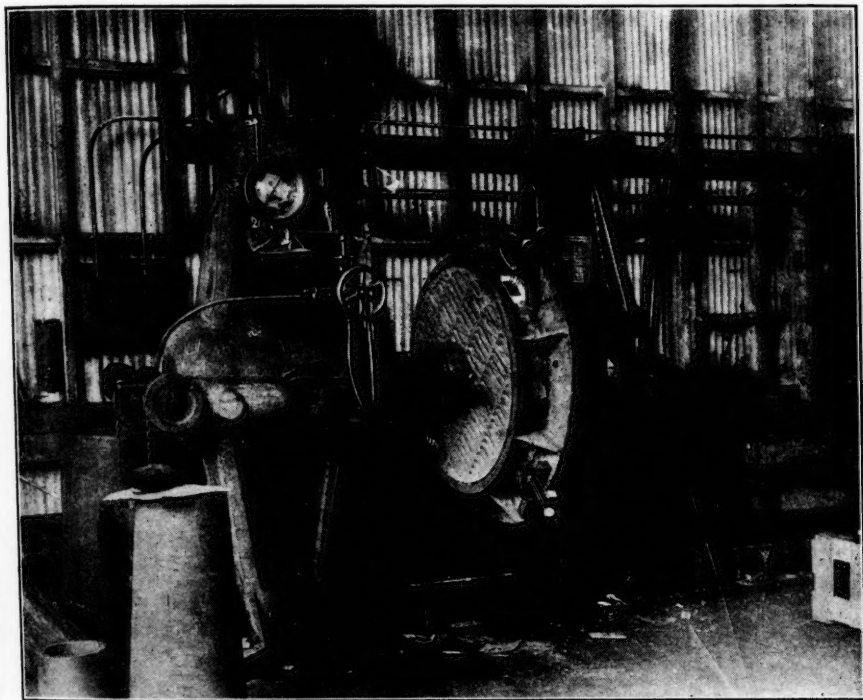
APPARATUS FOR TESTING MANHOLE COVERS.
